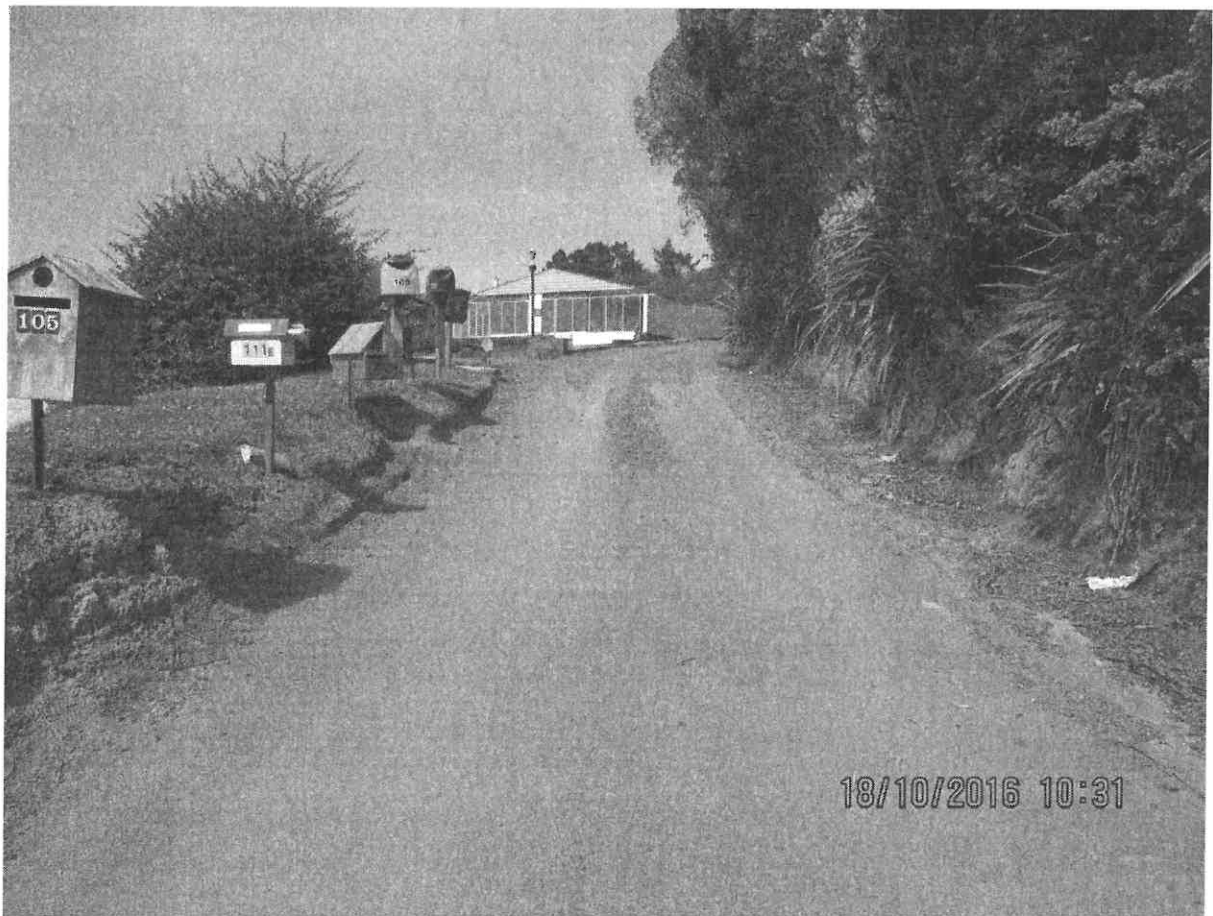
The sealed section of Lyders Road, with 107 Cliffs Road visible in centre of photo.
